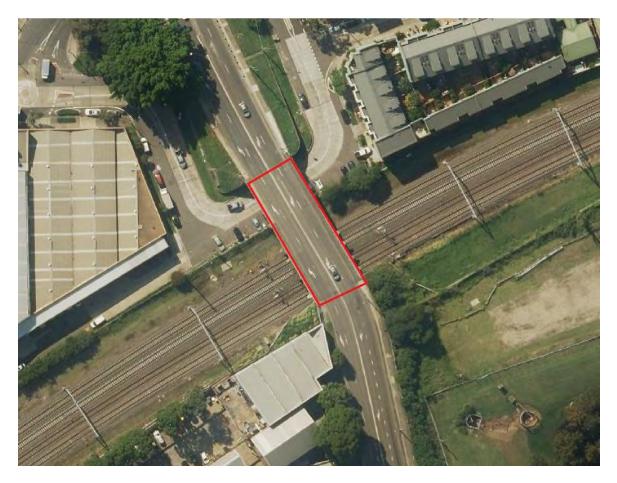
Aerial View of Bedwin Road Overbridge, outlined in red (Source: PLI SIX Viewer, accessed March 2018).
